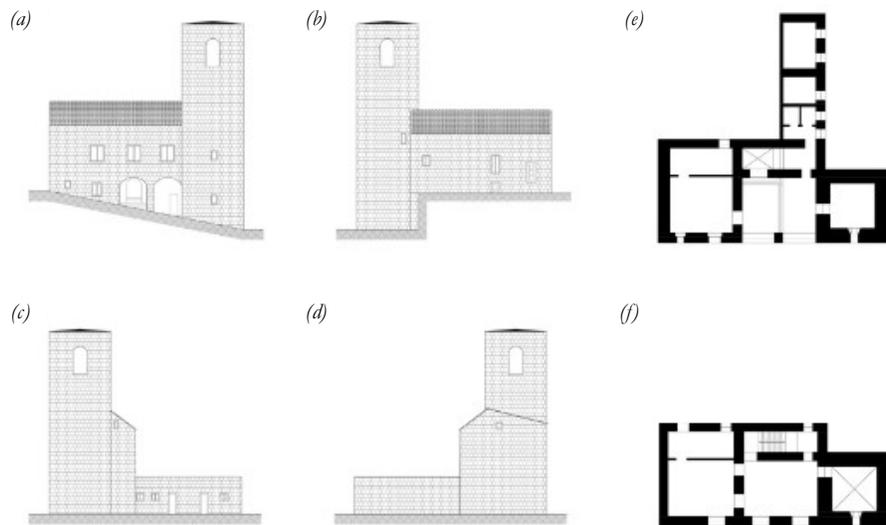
North (a), South (b), East (c) and West façade (d), Ground (e) and first floor (f).
